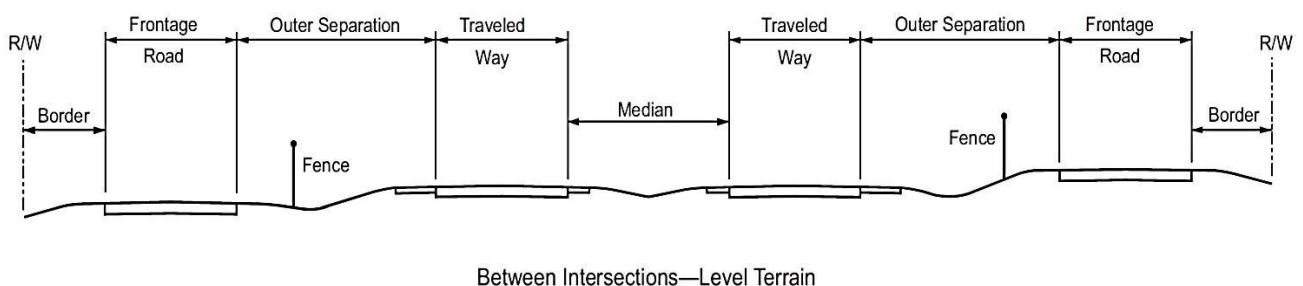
/4: Cross Sectional Arrangement on Divided Arterials With Frontages Roads. [1, p.7-23]
